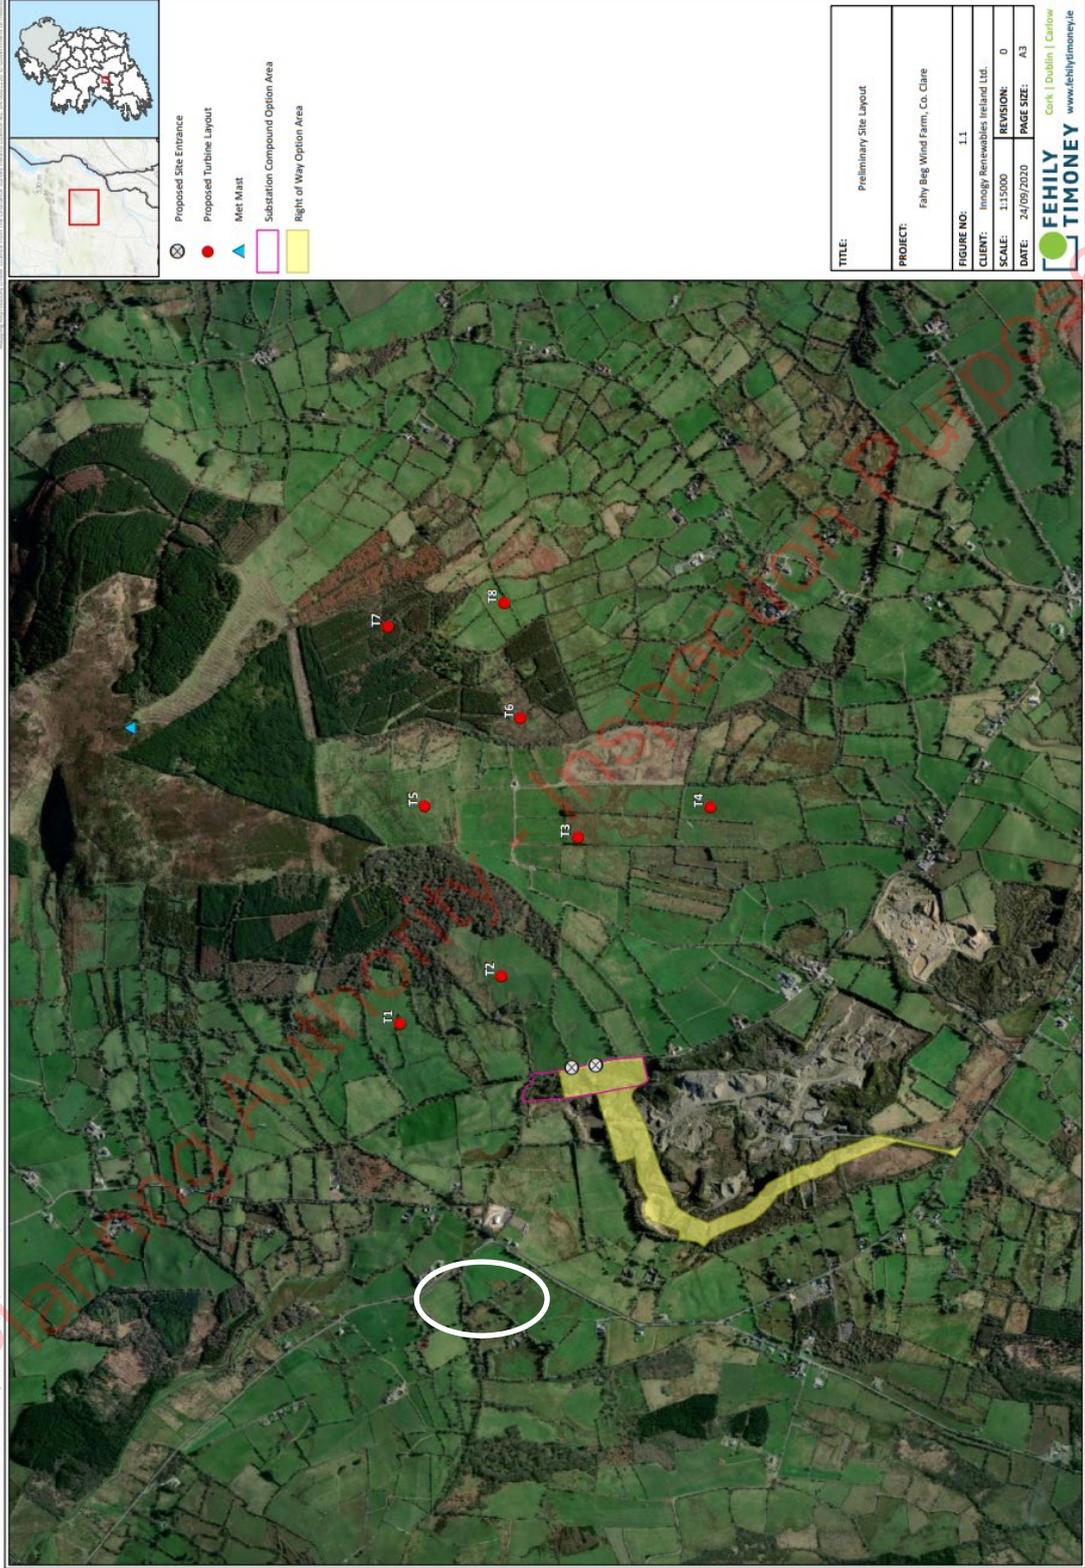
Preliminary Layout - Onsite Substation Location (September 2020)
